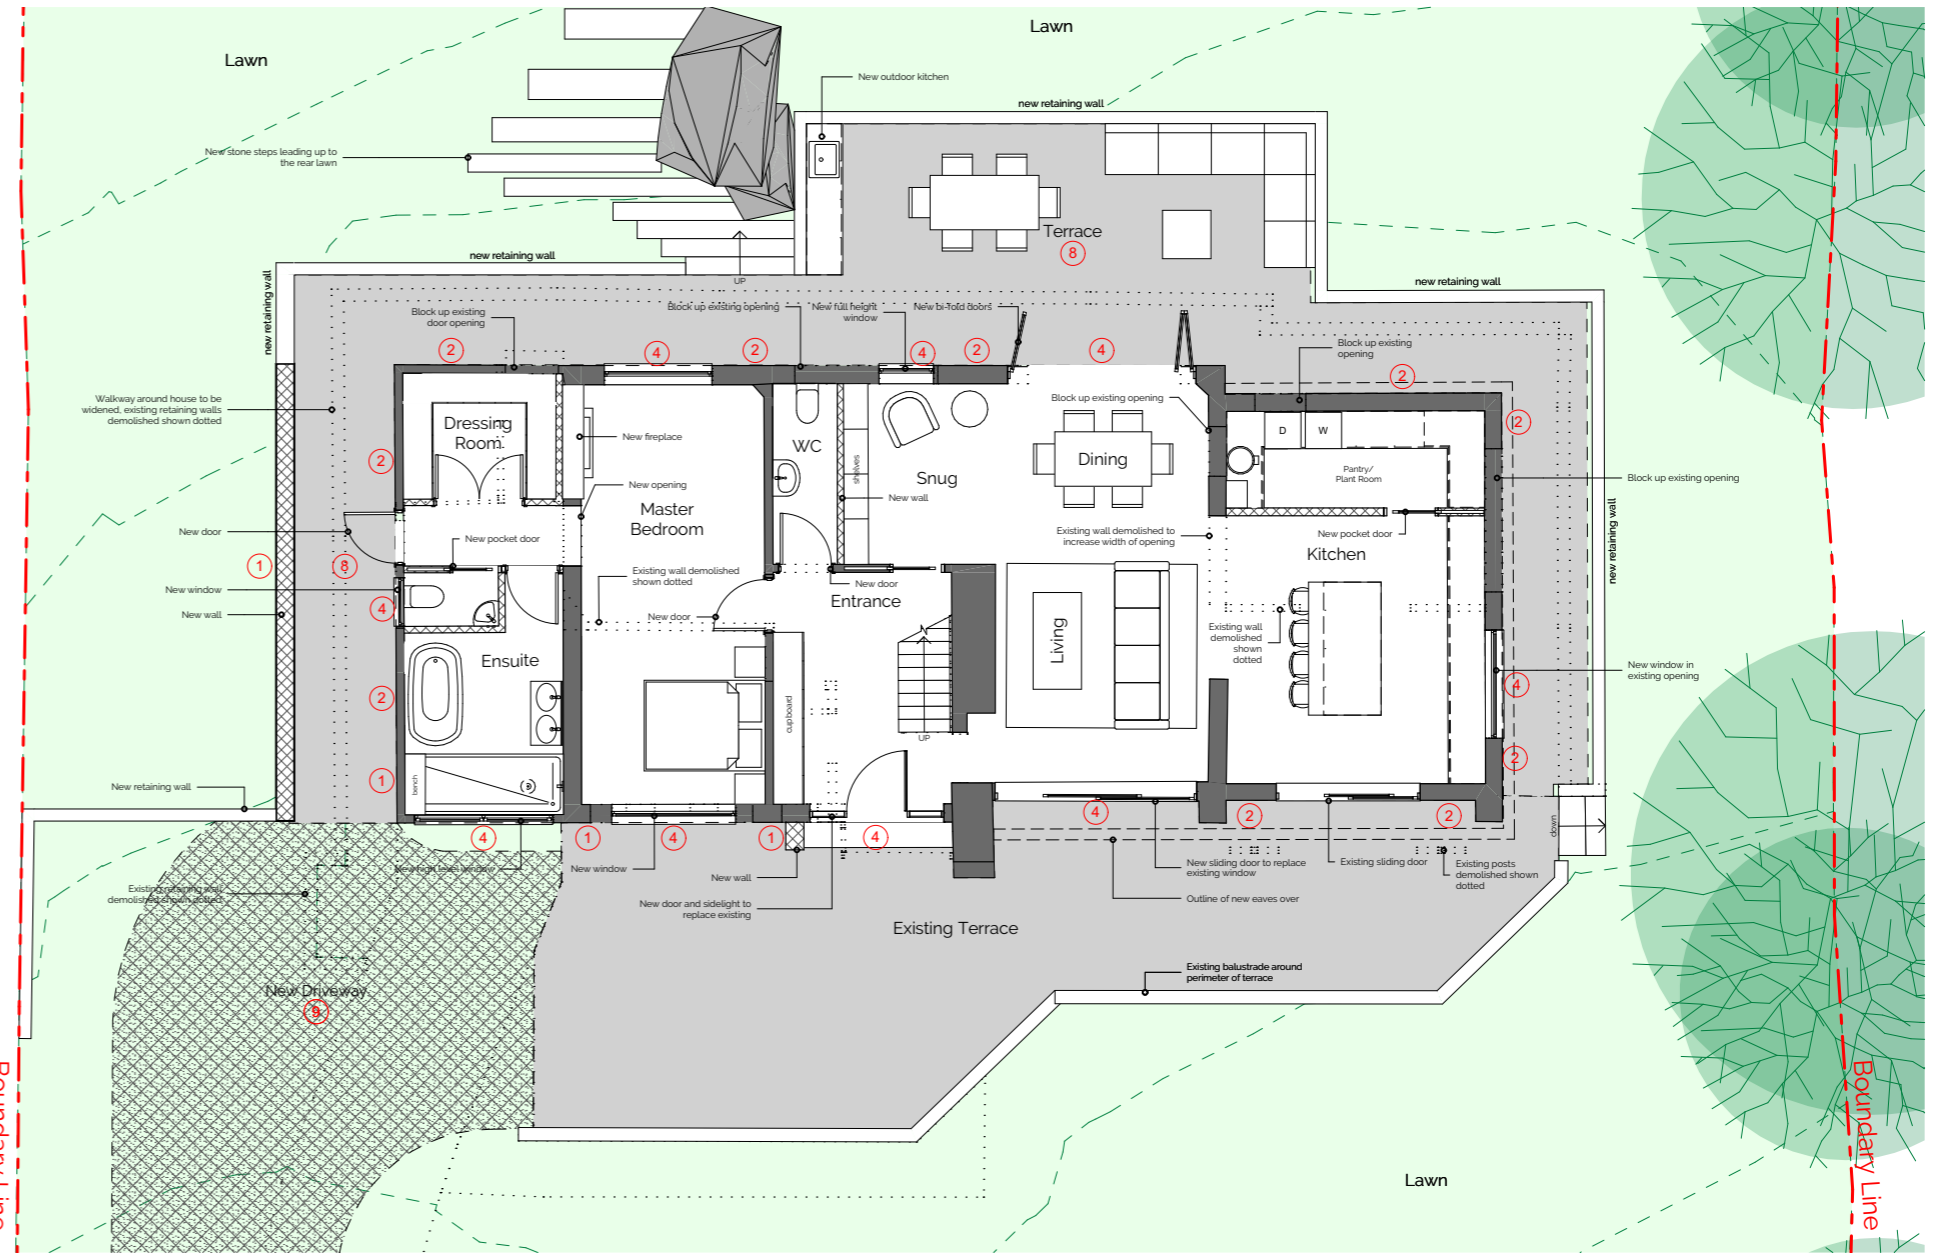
71 Leeson Road Proposed Ground Floor Plan - Not to Scale
